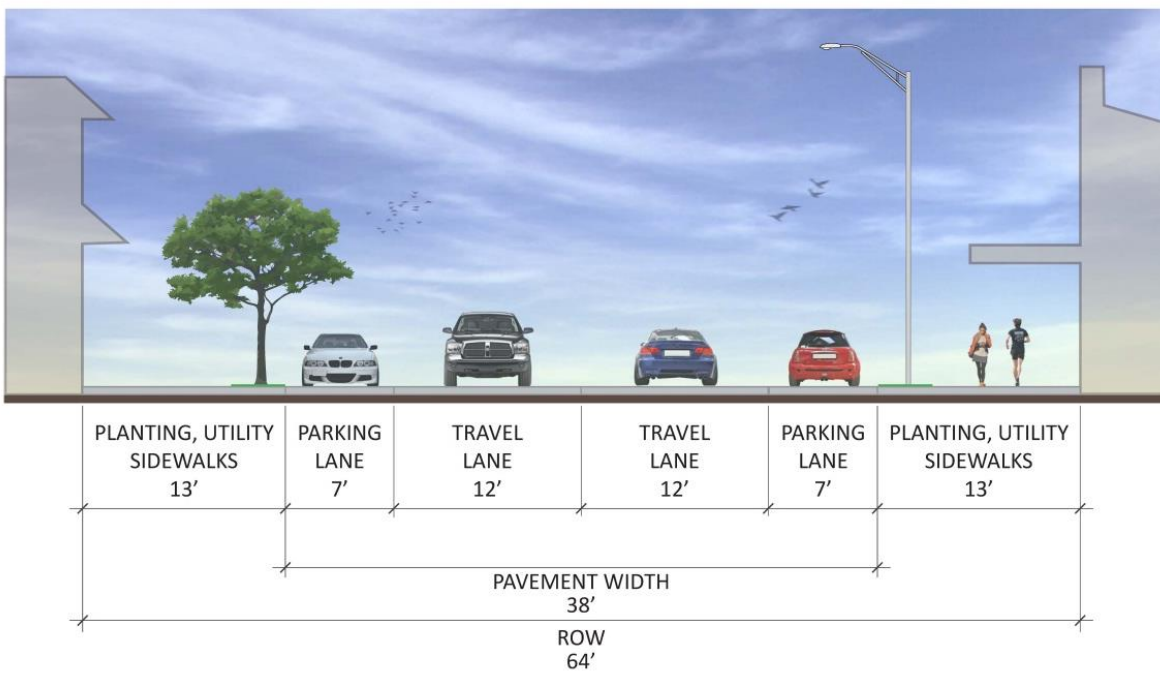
Urban Local Street Cross-Section - Option 2
